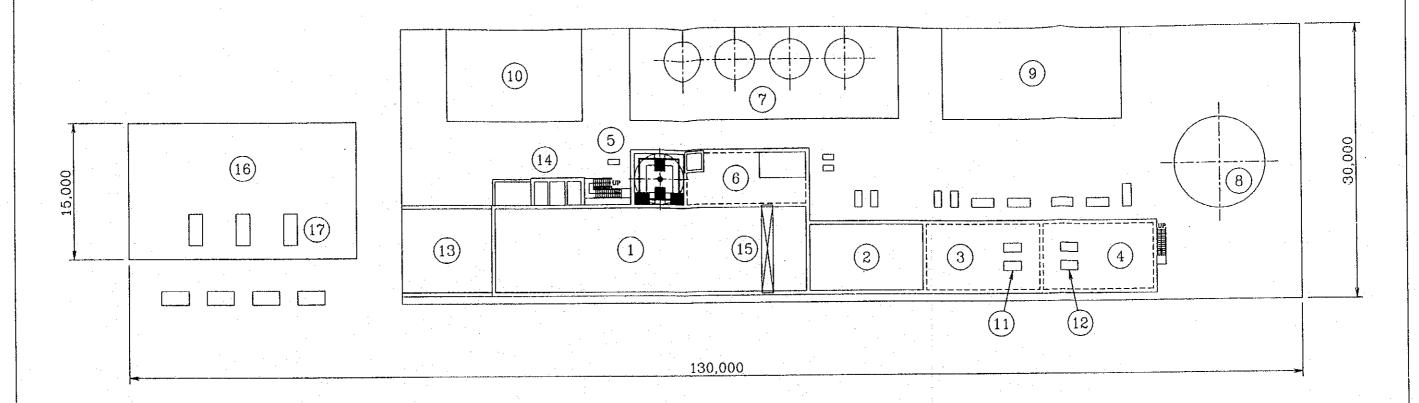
Layout of Desalination Plant and Raw Water Receiving Station
